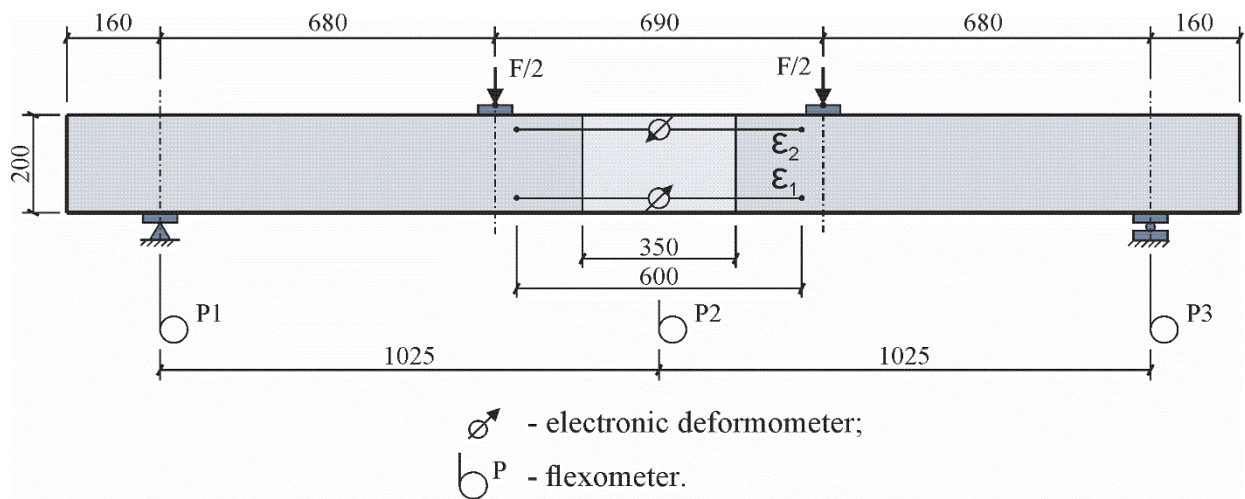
Scheme of loading and arrangement of measuring instruments during static testing of experimental beams
